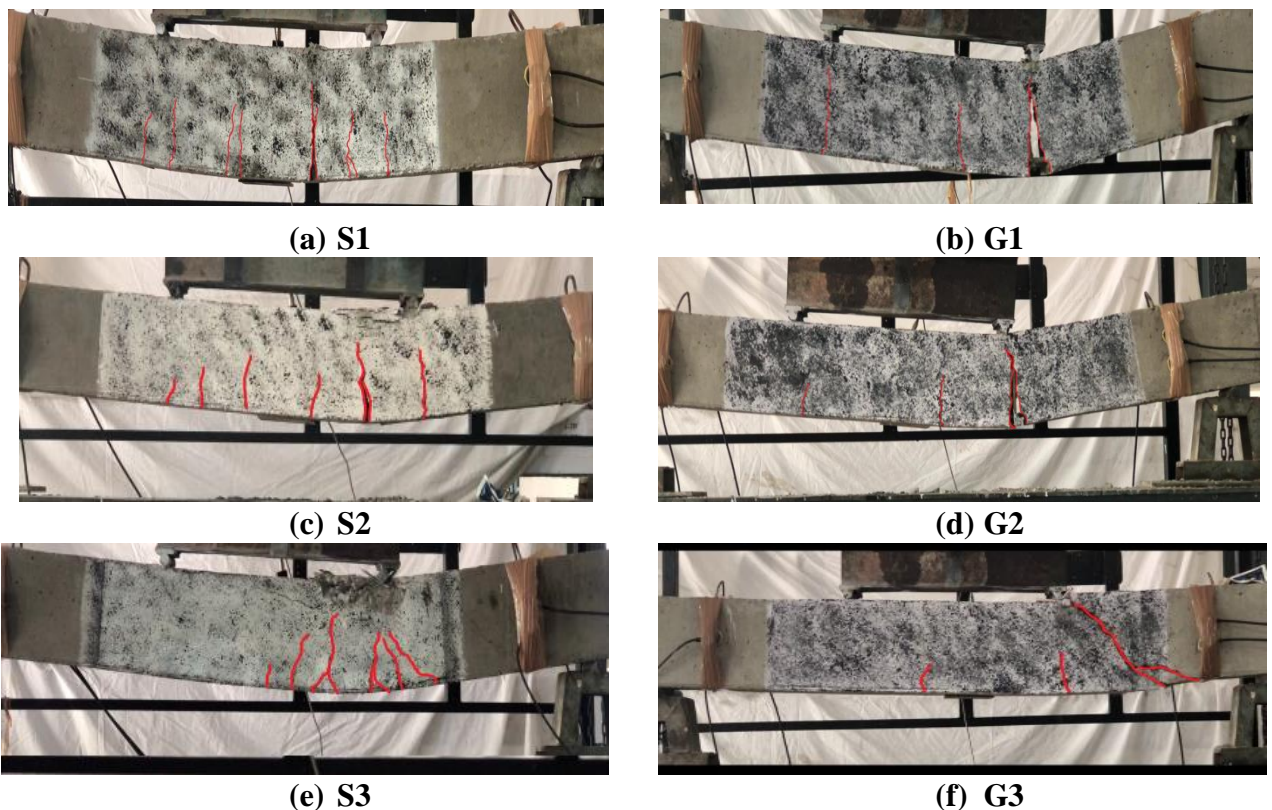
Failure modes in Steel and GFRP-RC beams
